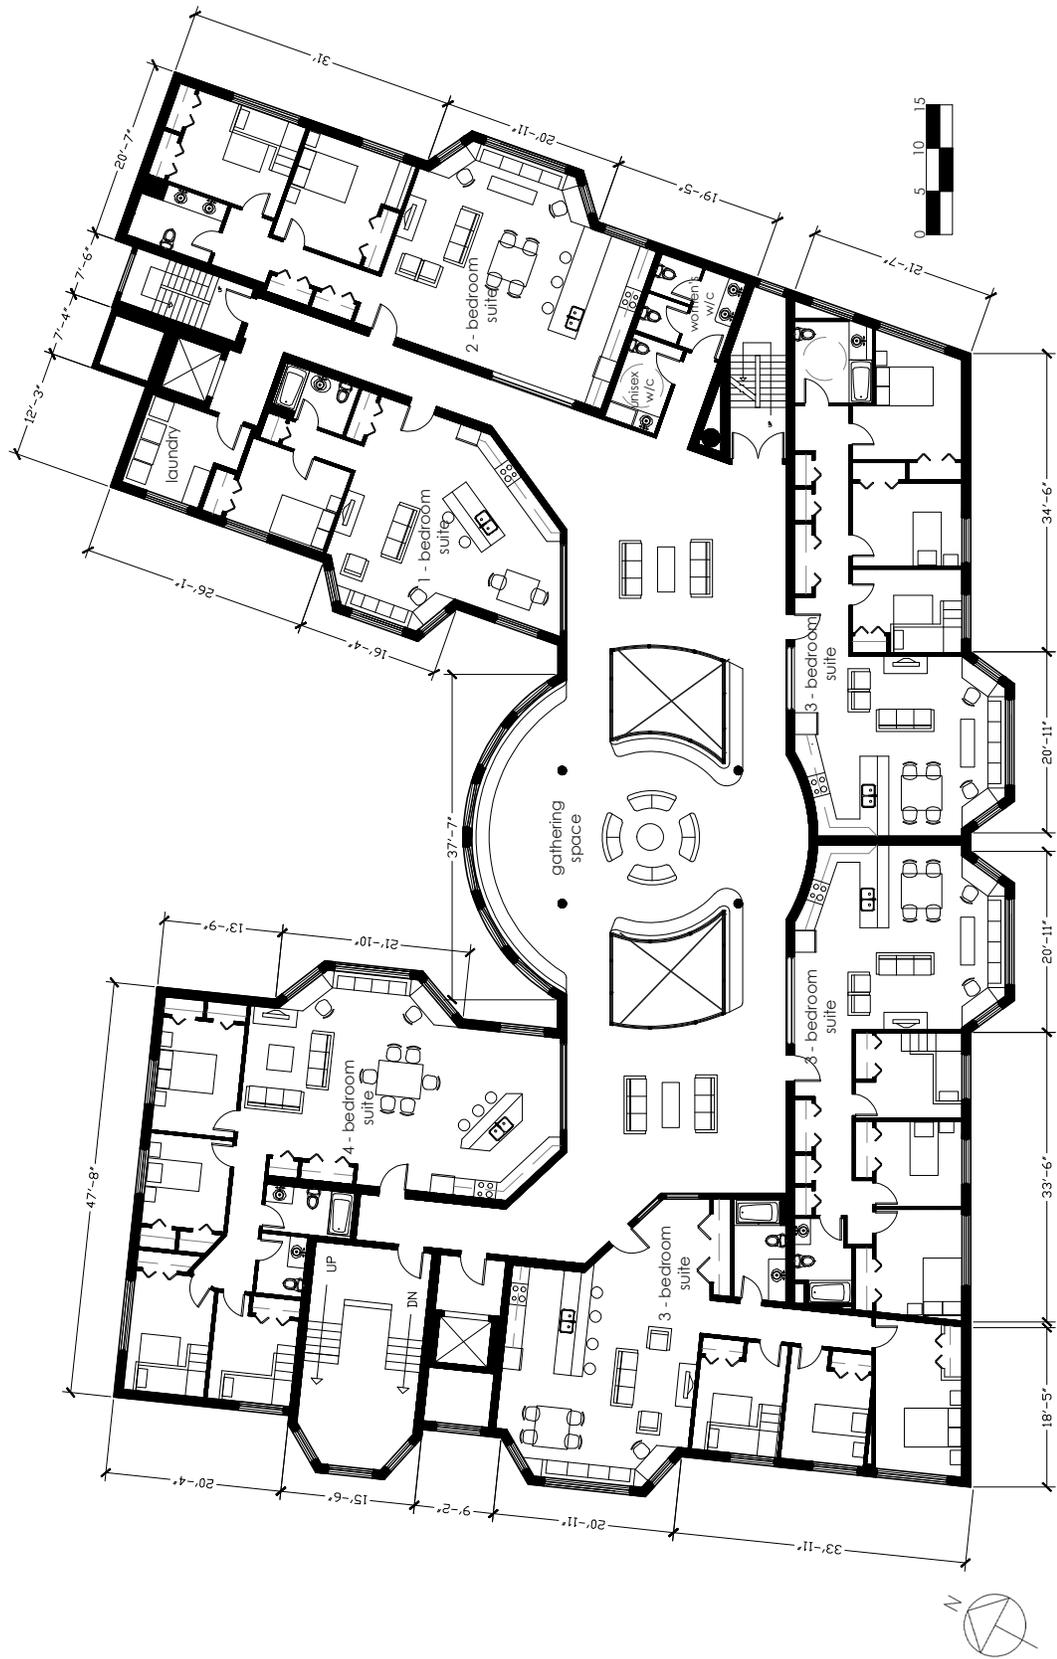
| BASEMENT DIMENSIONED FLOOR PLAN
